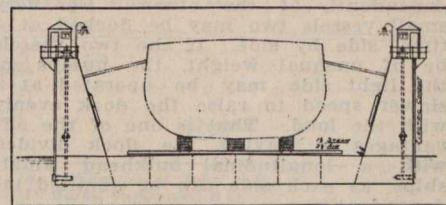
End Elevation of Floating Dry Dock, at Edson, Alta.
